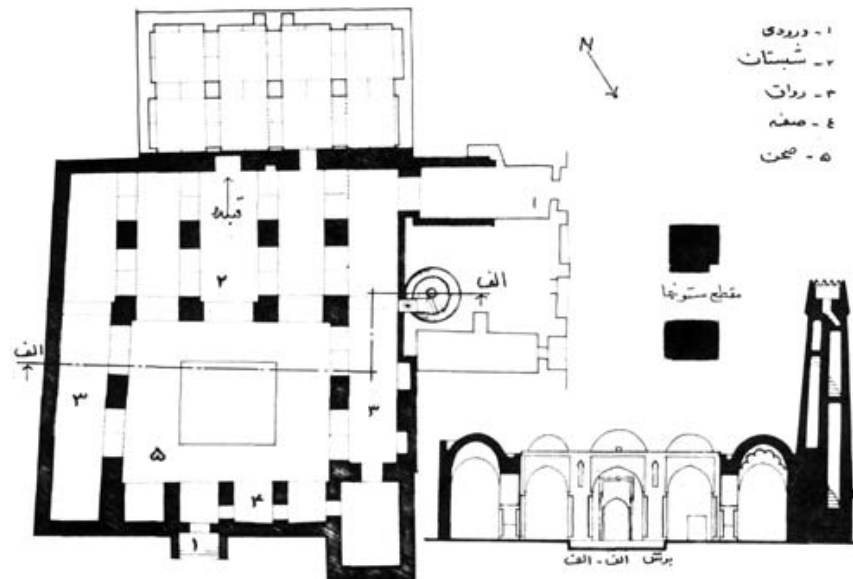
Plan and section view of Fahraj Friday Mosque (Source: Personal Archive)
